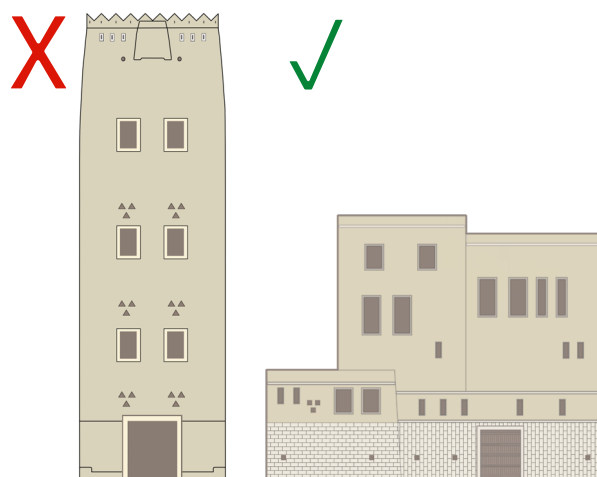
Break down building massing to better fit traditional elements of architectural character
